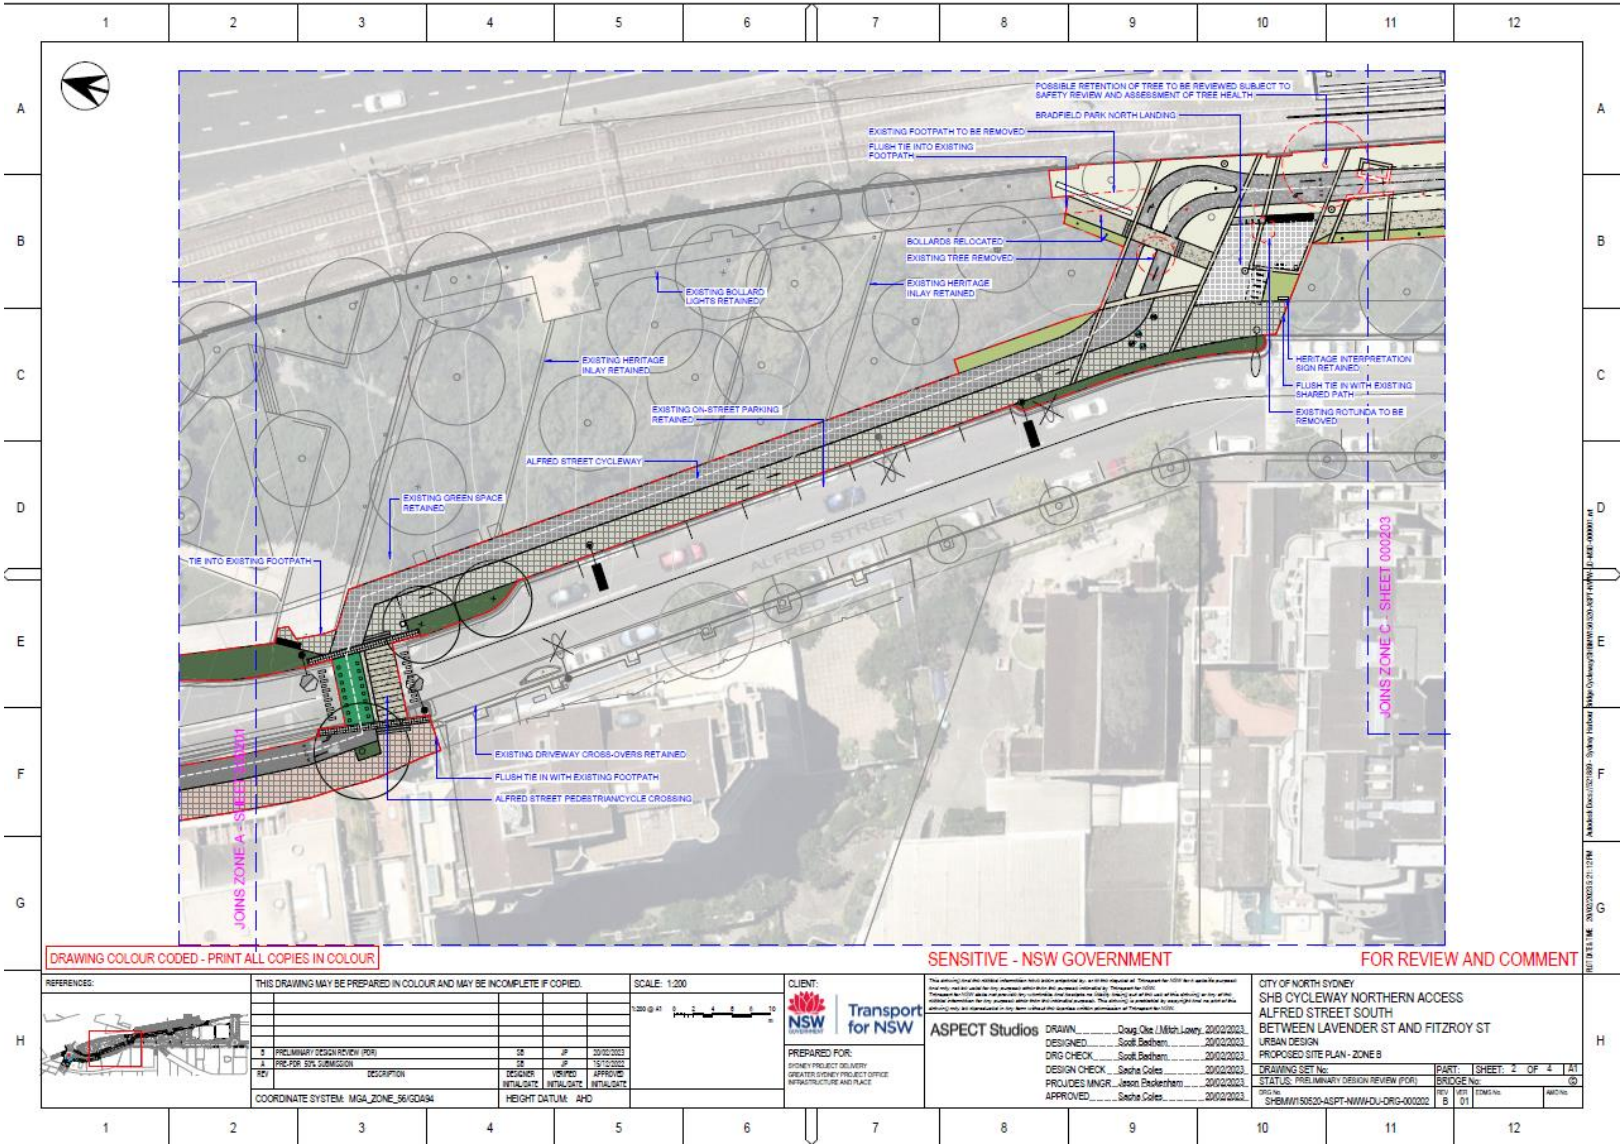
Proposed Site Plan – Zone B (Source: Aspect, 2023)
